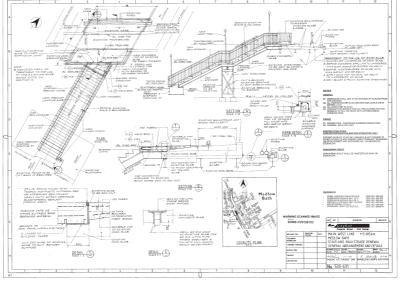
1994. Medlow Bath Stair and Balustrade renewal general arrangement and details.
